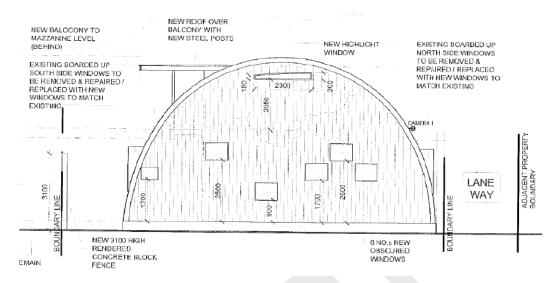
East elevation showing proposed works. Drawing dated 2009 (YCC BP).
